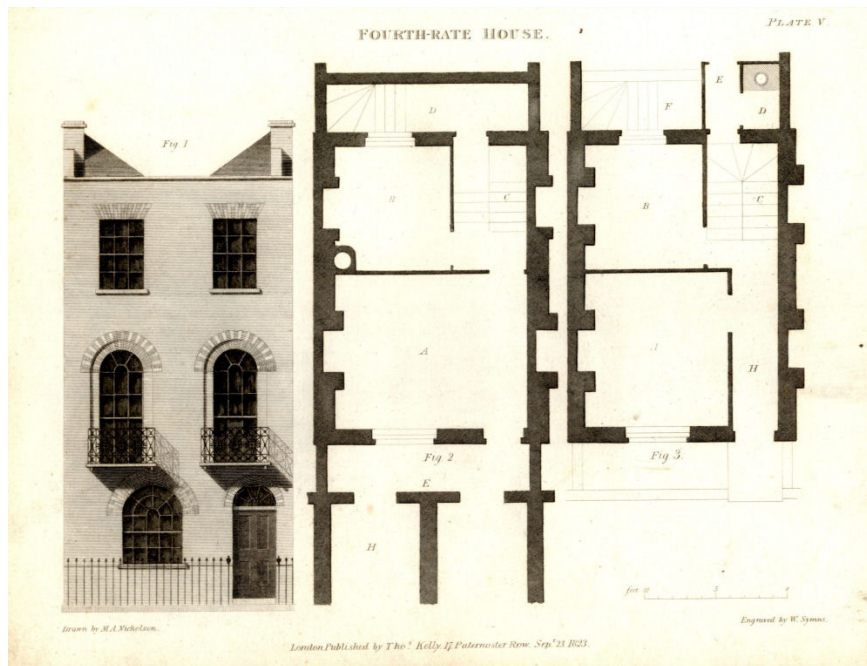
Contemporary drawings of First to Fourth rate houses show the use of on-edge brick copings to the top of the party walls
